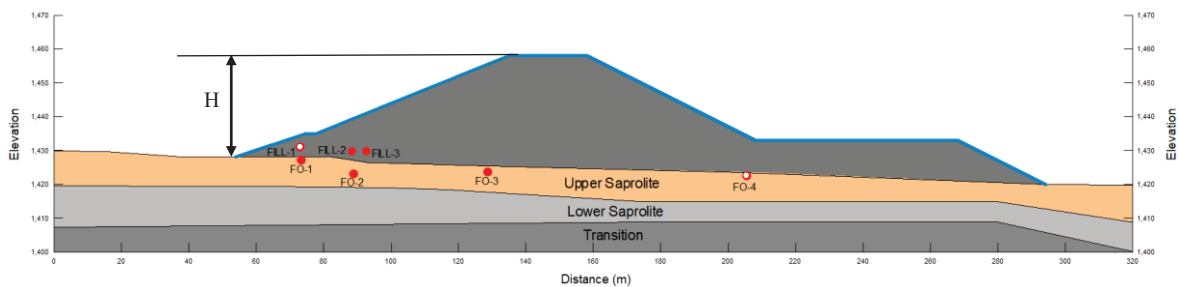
Schematic of location of instrumentation for dam monitoring.
